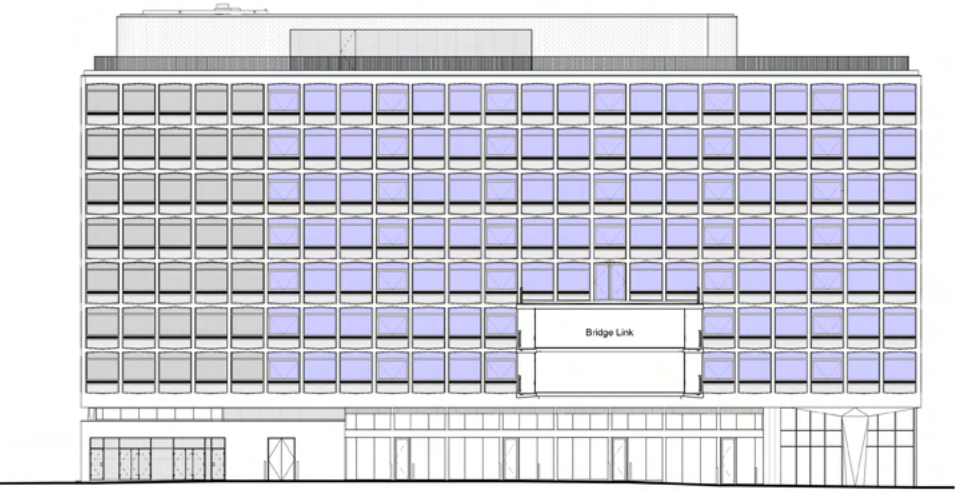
Kingsway East Elevation - MAT 03 location
